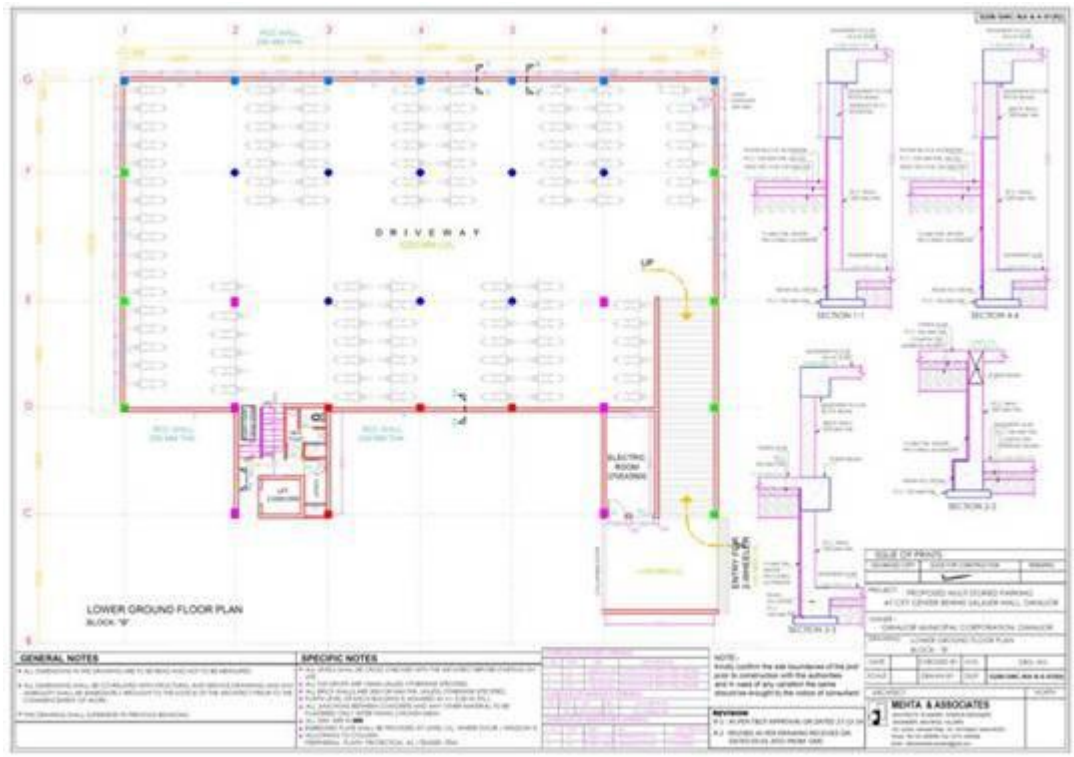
Parking Location: Salasar Multi Level Parking (Basement-Block B)
